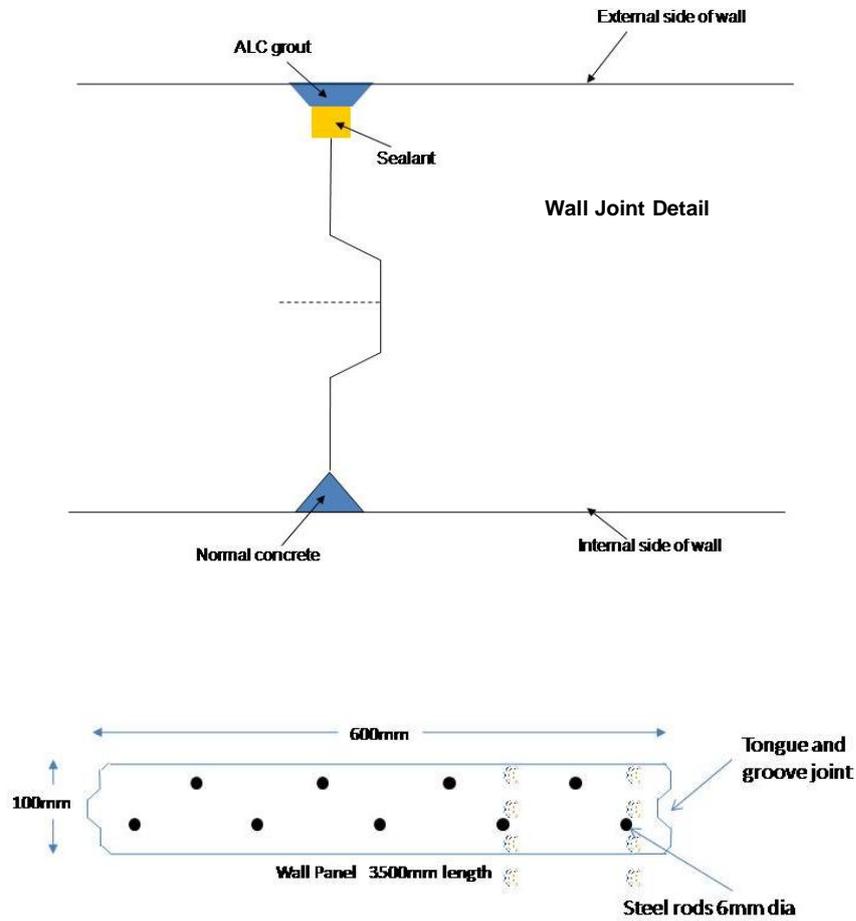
Joint Detail and Cross Section of ALC wall panel
